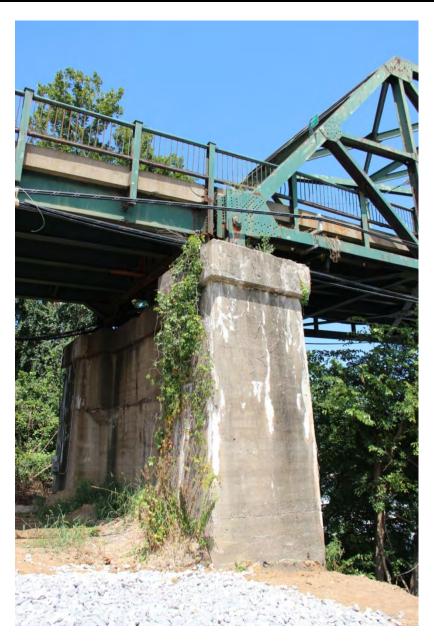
SOUTHWEST AND SOUTHEAST ELEVATION OF BRIDGE PIER NO. 1 SHOWING BRIDGE SHOE AND ANCHORAGE ASSEMBLY OF CANTILEVER TRUSS SPAN NO. 6, FACING NORTHWEST.
